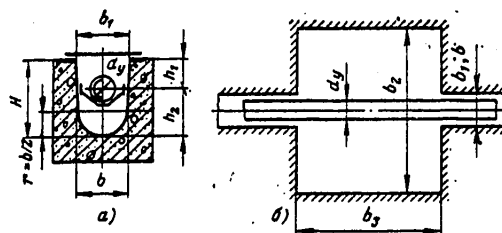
Conduits and pits of special networks with pipelines  $d_y = 40-200$ . a--section of the conduit with epoxy coating (for channels lined with stainless steel  $b_1 = b$ ); b--plan view of the installation-welding pit (height of the pit chamber is equal to the height of the channel). For the dimensions see Table 1-6.
